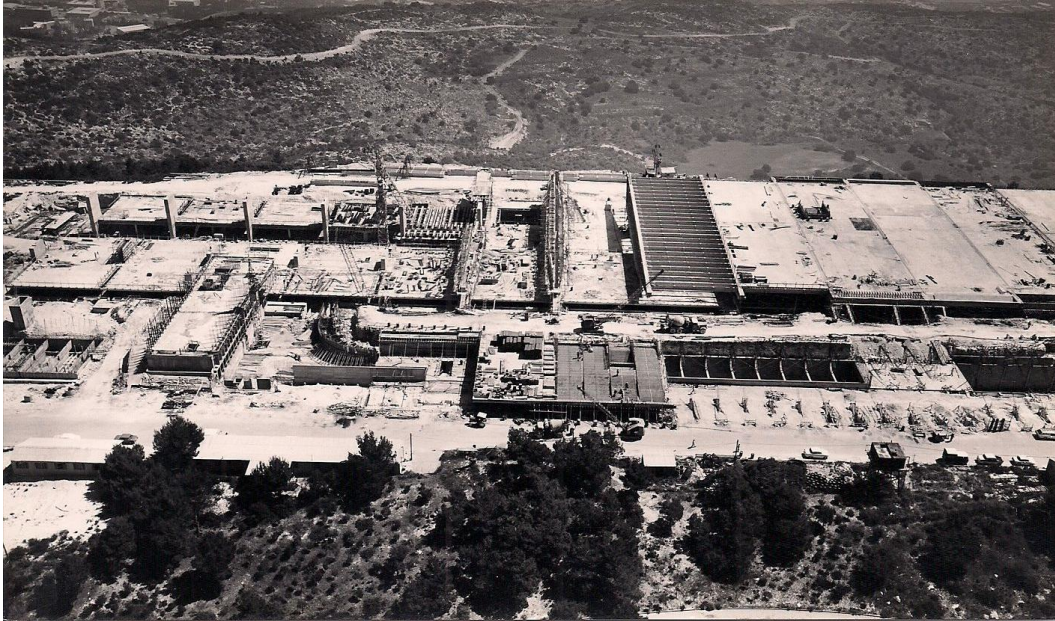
Construction of the main building of the University of Haifa, looking north-east, ca. 1970 (University of Haifa Archive). The structural frame of the basement floors of the Eshkol Tower, protruding from the rectangular shape of the main building, can be seen on the left
